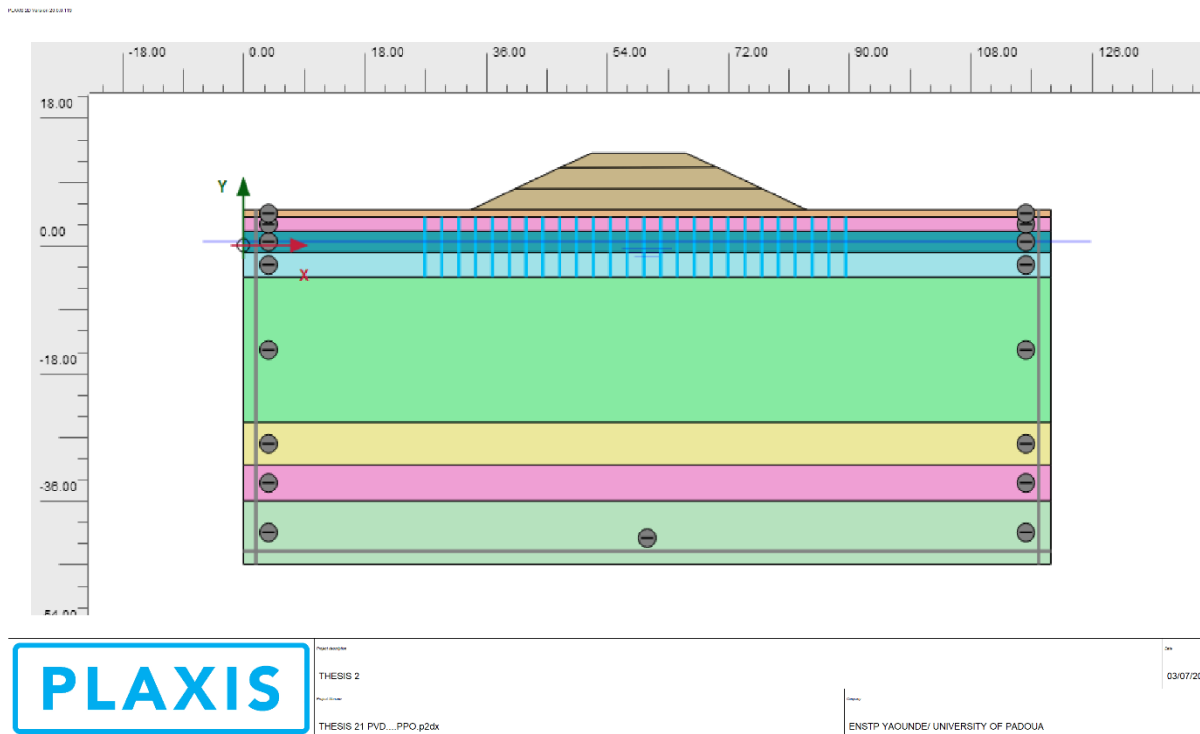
Model of embankment load on soft soil reinforced with PVD
